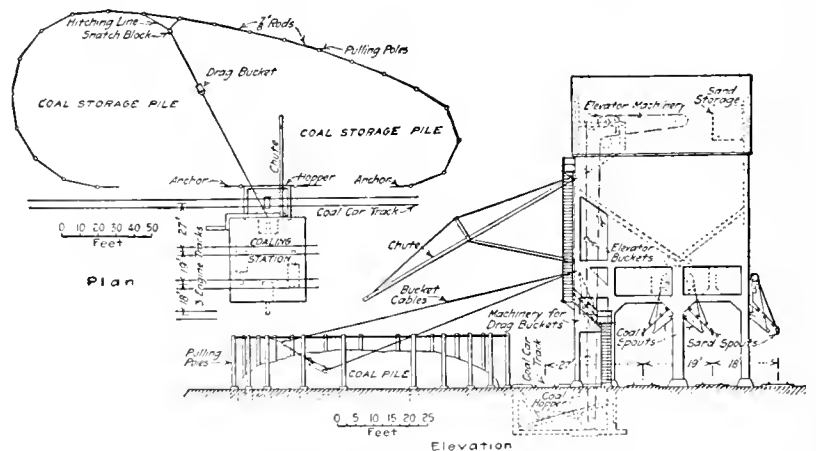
Plan and Section of Coal Handling Plant of Southern Railway at Air Line Junction, Va.
